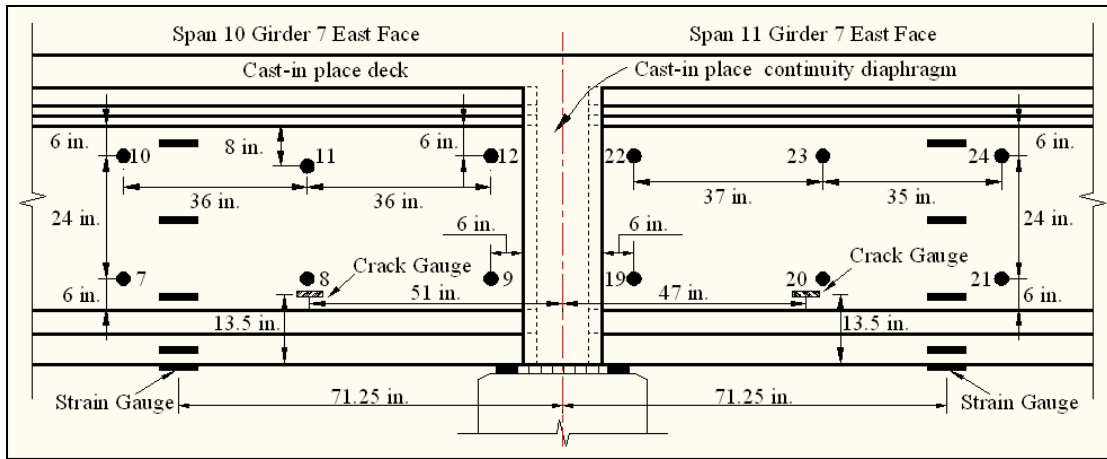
Sensor configuration on east face of Girder 7 (Xu 2008)
